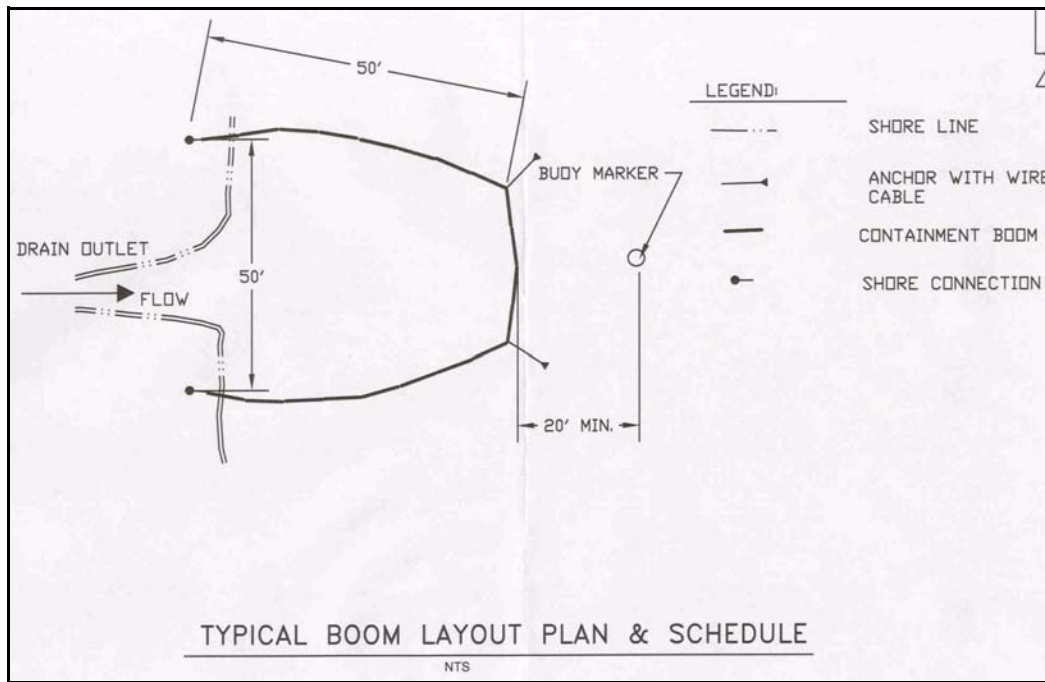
Schematic of proposed spill containment booms to be installed as part of the East of Hudson Catskill and Delaware Spill Containment Plan.
